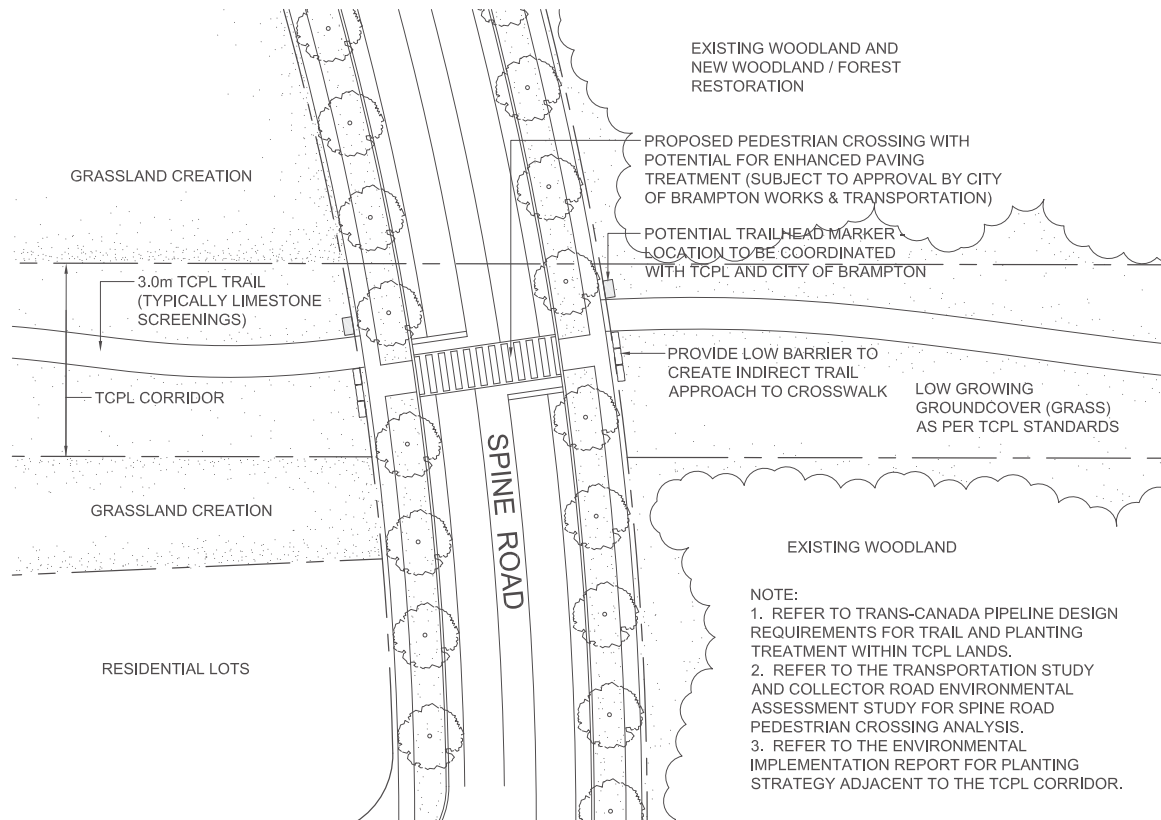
Conceptual TCPL trail crossing at the Spine Road.
